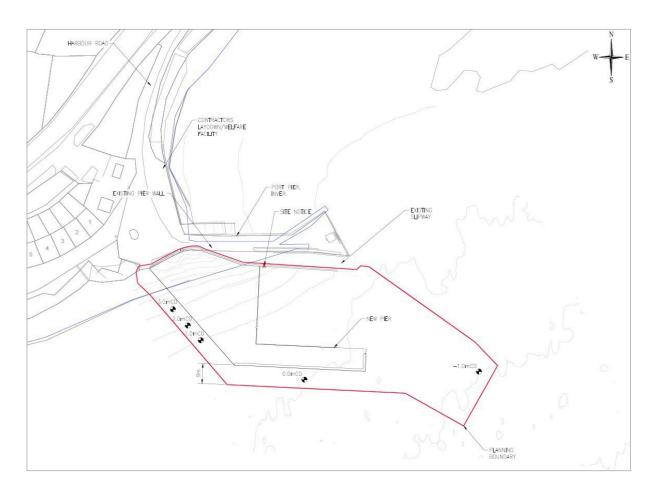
Proposed extension layout and site boundary to include dredging (AYESA 2025).
